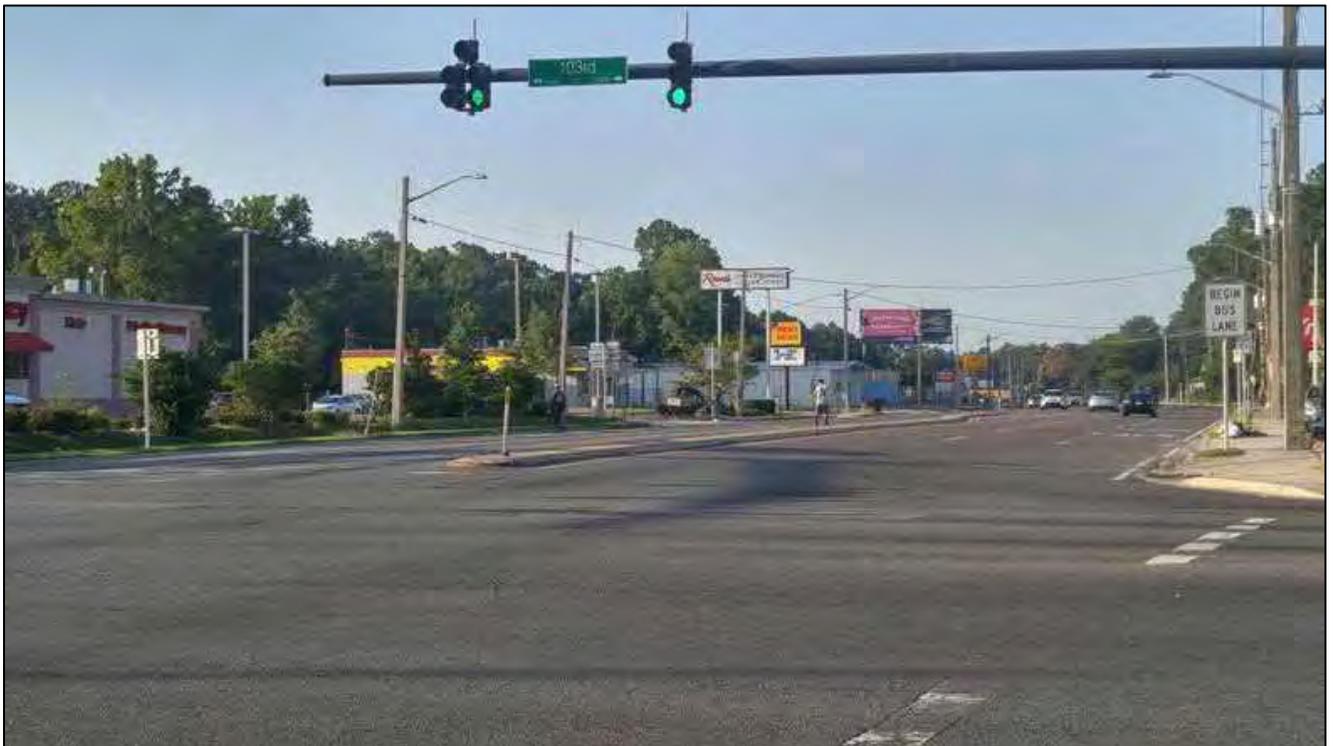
Looking East – Faded crosswalk north leg and pavement rutting
